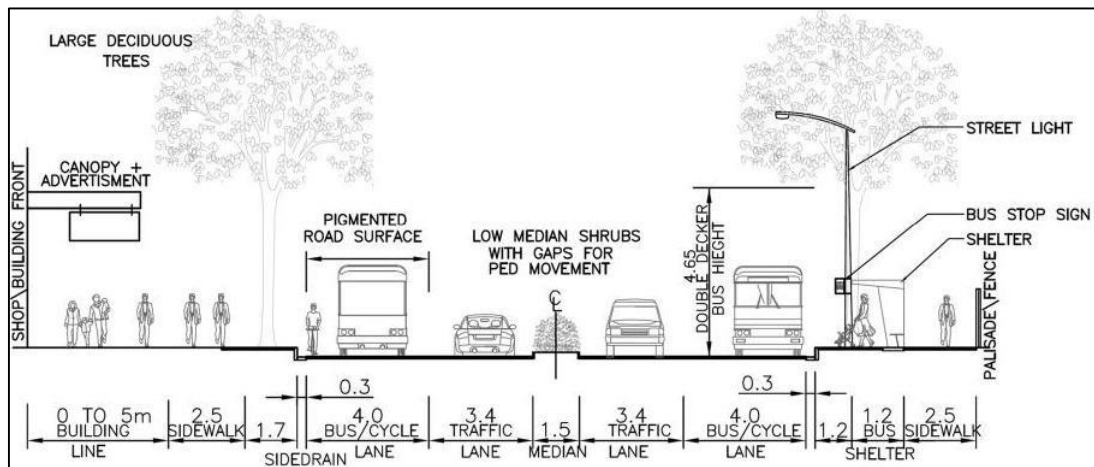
Road Space Reallocation - Typical road cross-section (Robertson, 2013).
